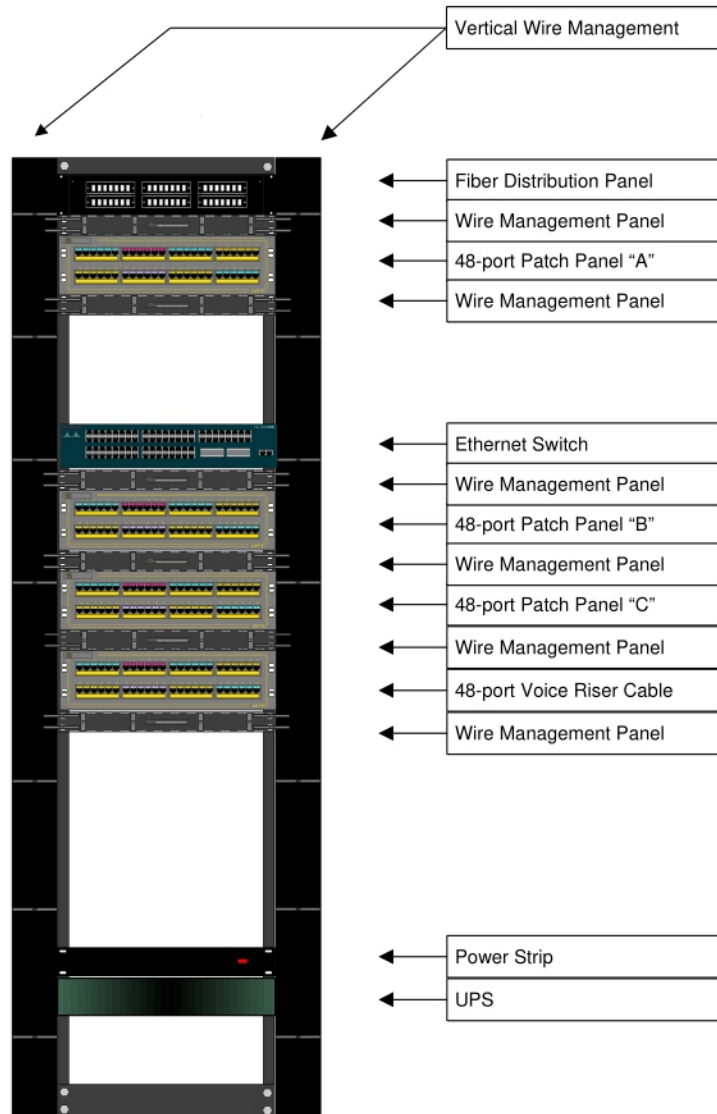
Typical Single Rack Layout for Smaller Installations
